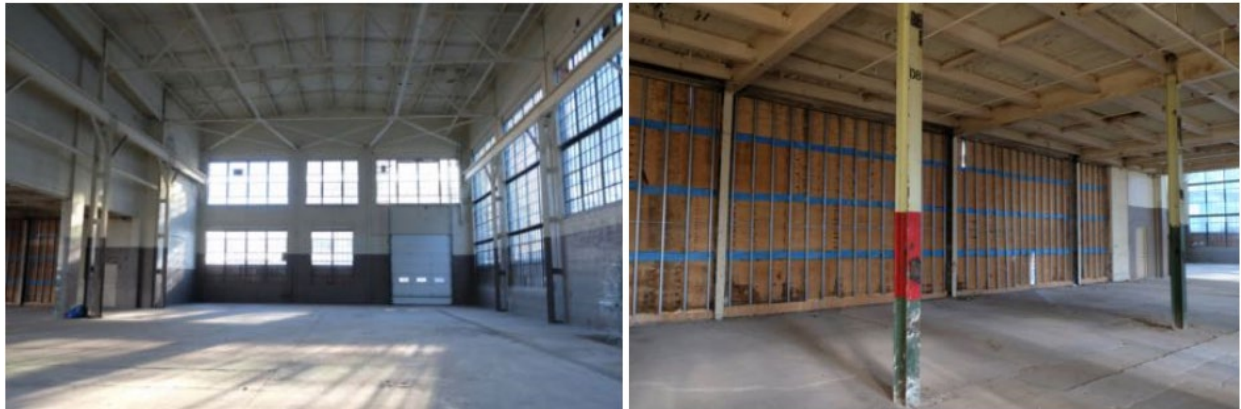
Interior view of 185 Eastern Avenue (Machine Shop building), showing the eastern addition looking north (at left) and the central portion looking northwest (at right) (Philip Goldsmith Architect, 2025).
